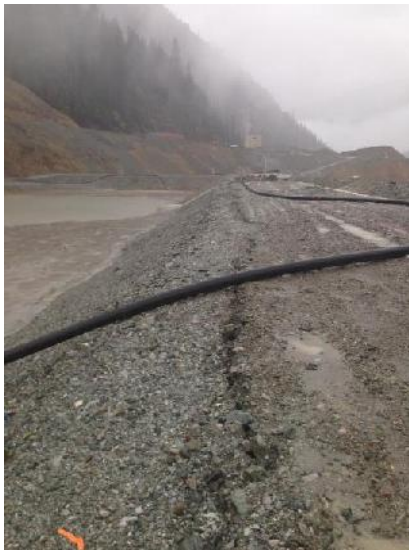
Cracking of the upstream shell of Lynx Dam south arm (looking east).
